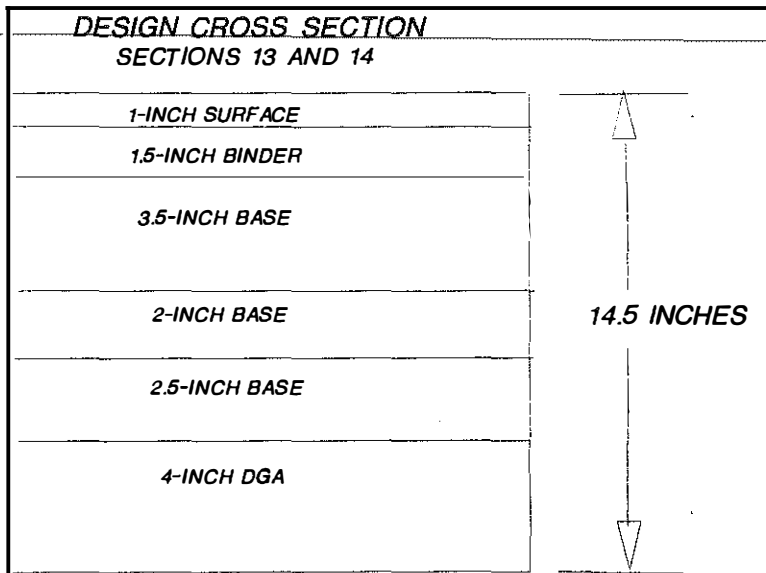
Design (and As-Built) Pavement Cross Section of Section AA-13 and AA-14.
